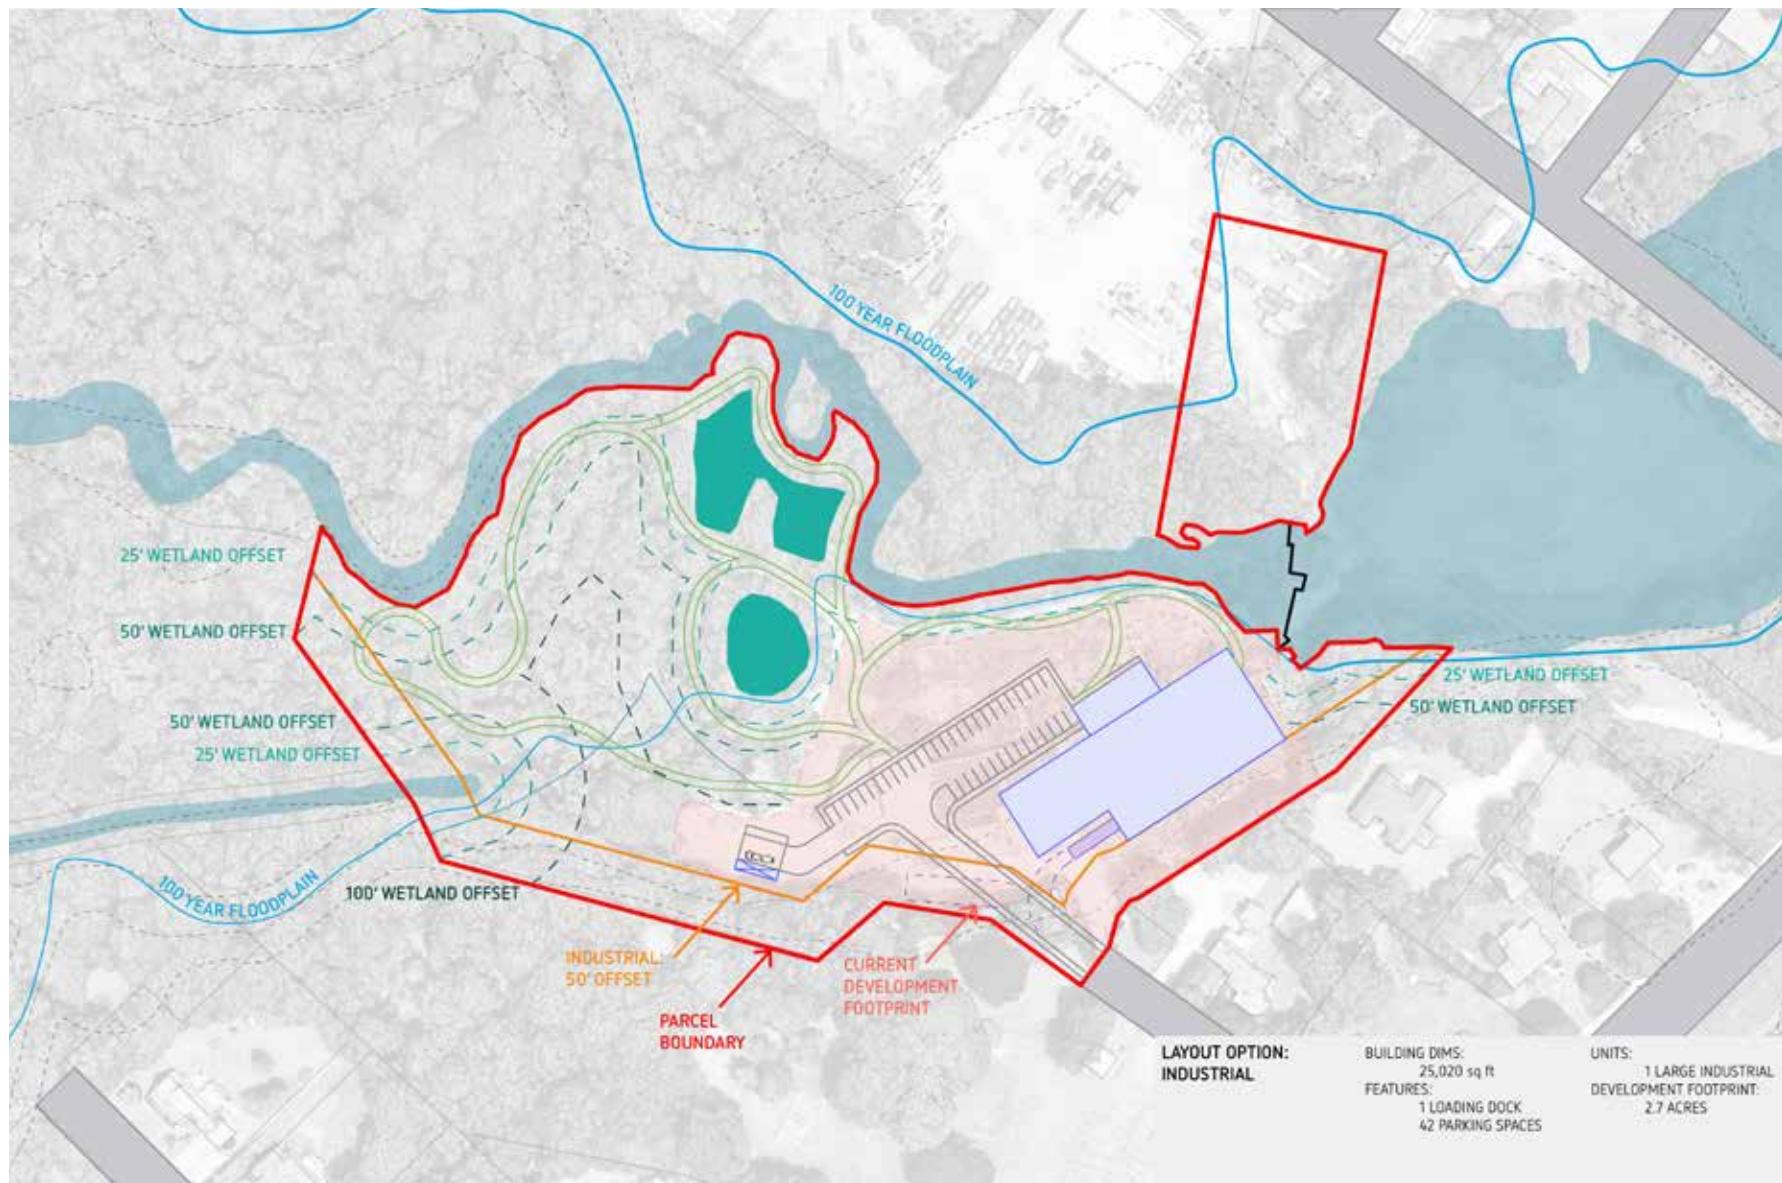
The industrial development concept plan illustrates a one-story building with approximately 25,000 square feet of floor area, complemented by riverfront and woodland trails.
